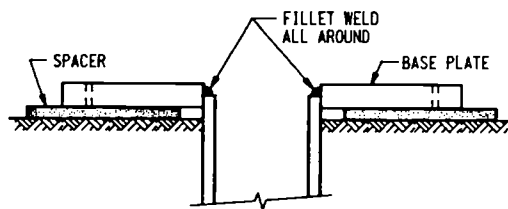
Cross section showing attachment of base plate to pipe pile.
